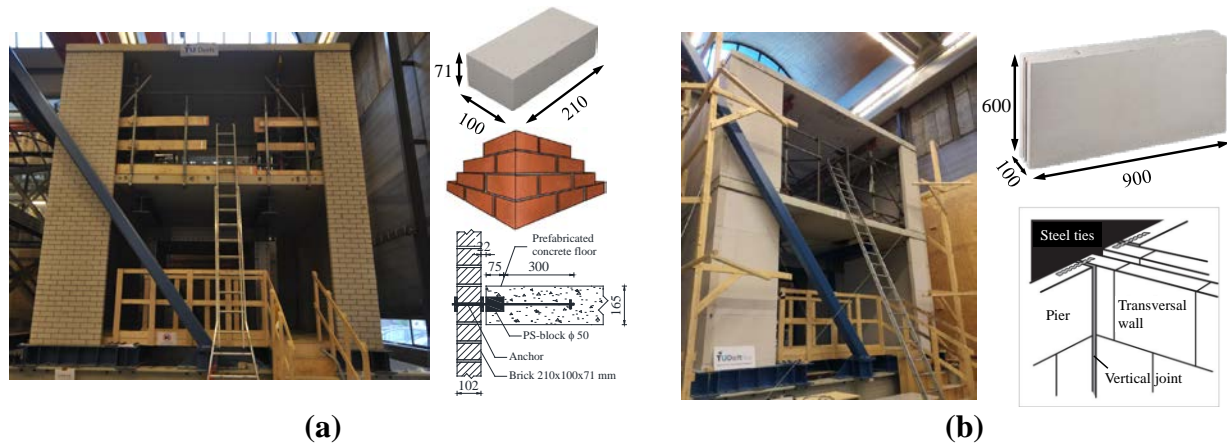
Specimens and main construction details: (a) CS brick masonry assemblage; (b) CS element masonry assemblage.
